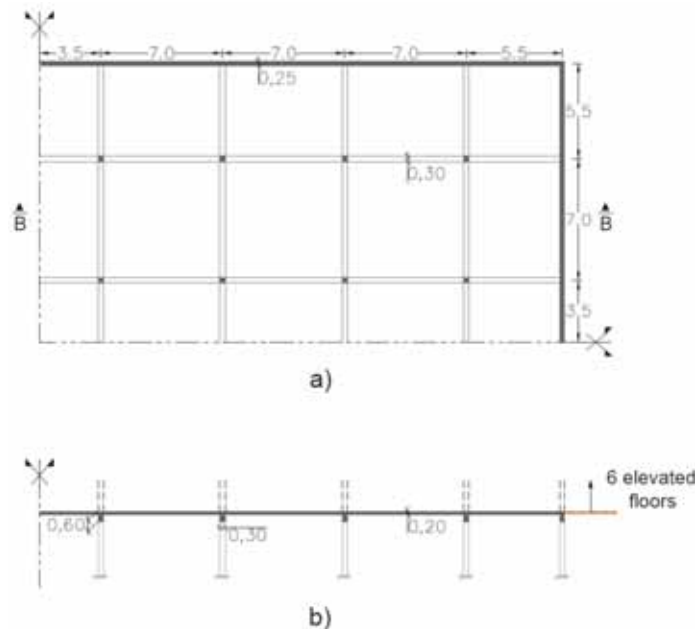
Scheme of the RC structure: a) floor plan; b) elevation B-B (dimensions in [m]).
